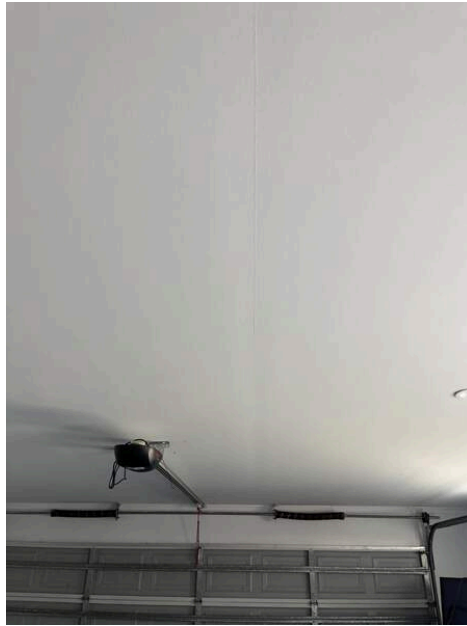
There is moderate cracking and ceiling separation in the garage ceiling. This should be monitored for further deterioration and repaired as necessary
